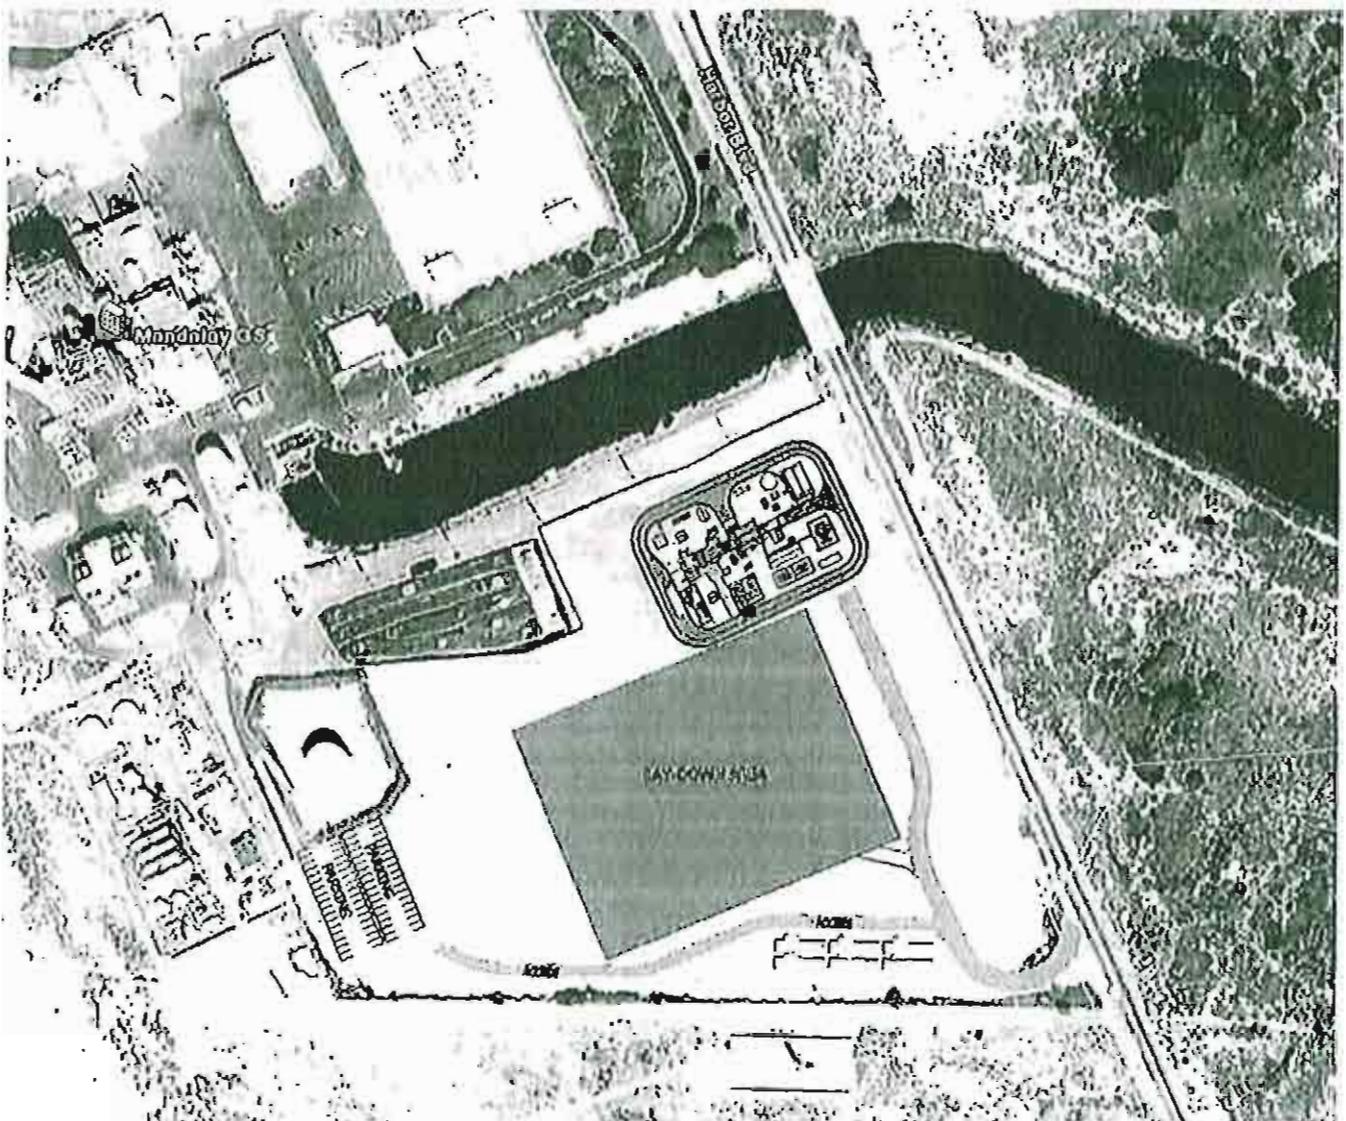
Aerial Photograph of the Facility with Facility Construction Layout
